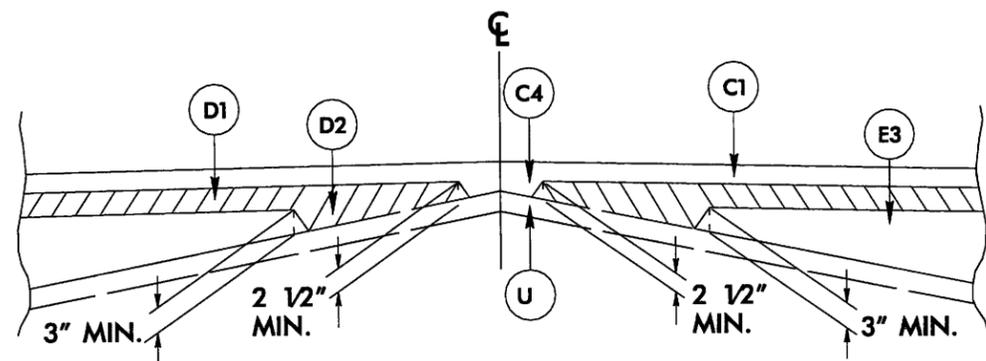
DETAIL FOR STAGE 1 CONSTRUCTION OF BRIDGE
